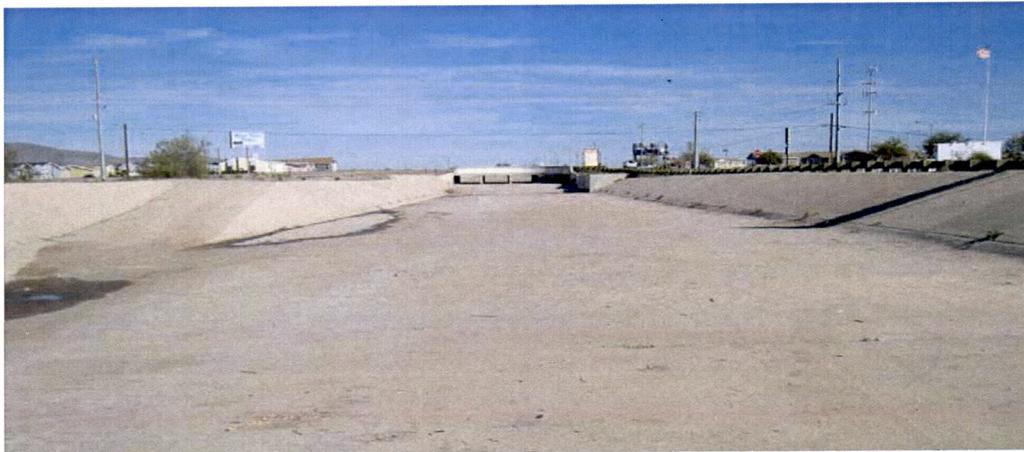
Existing Concrete Channel at Reach 9: View from I-10 north to McDowell Road Culverts
